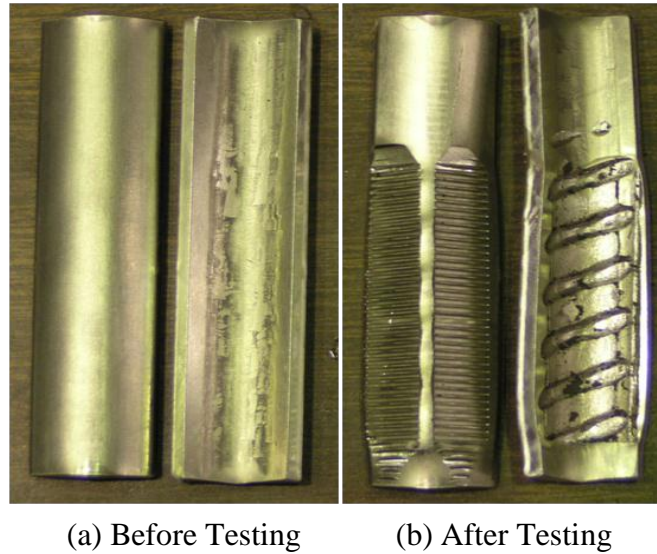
Aluminum sleeves used to ensure uniform grip at bar ends
